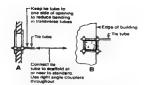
Box Se. A. Vertical or horizontal section through wall 8. Horizontal or vertical section through structural member
